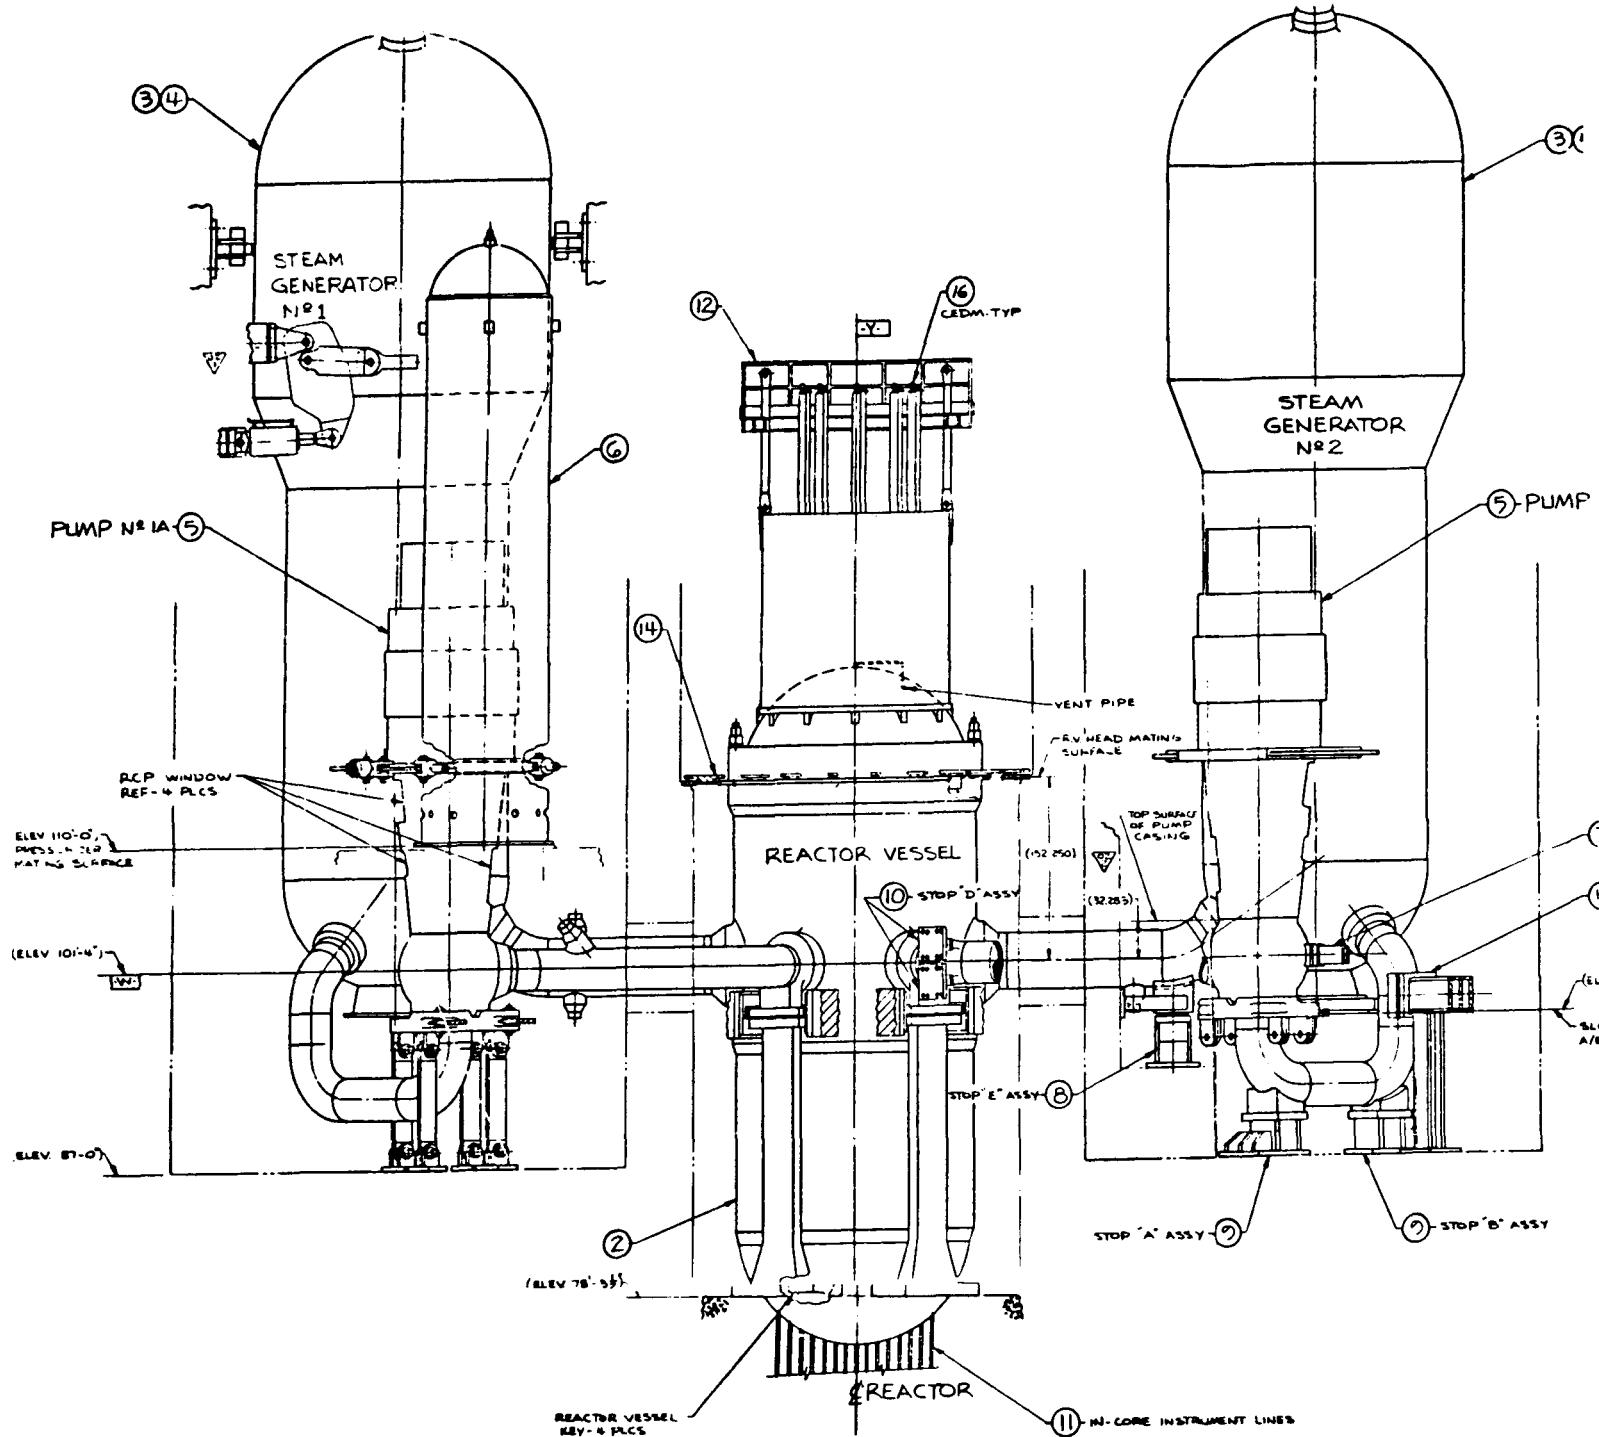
PALO VERDE REACTOR COOLANT LOOP ARRANGEMENT - ELEVATION
